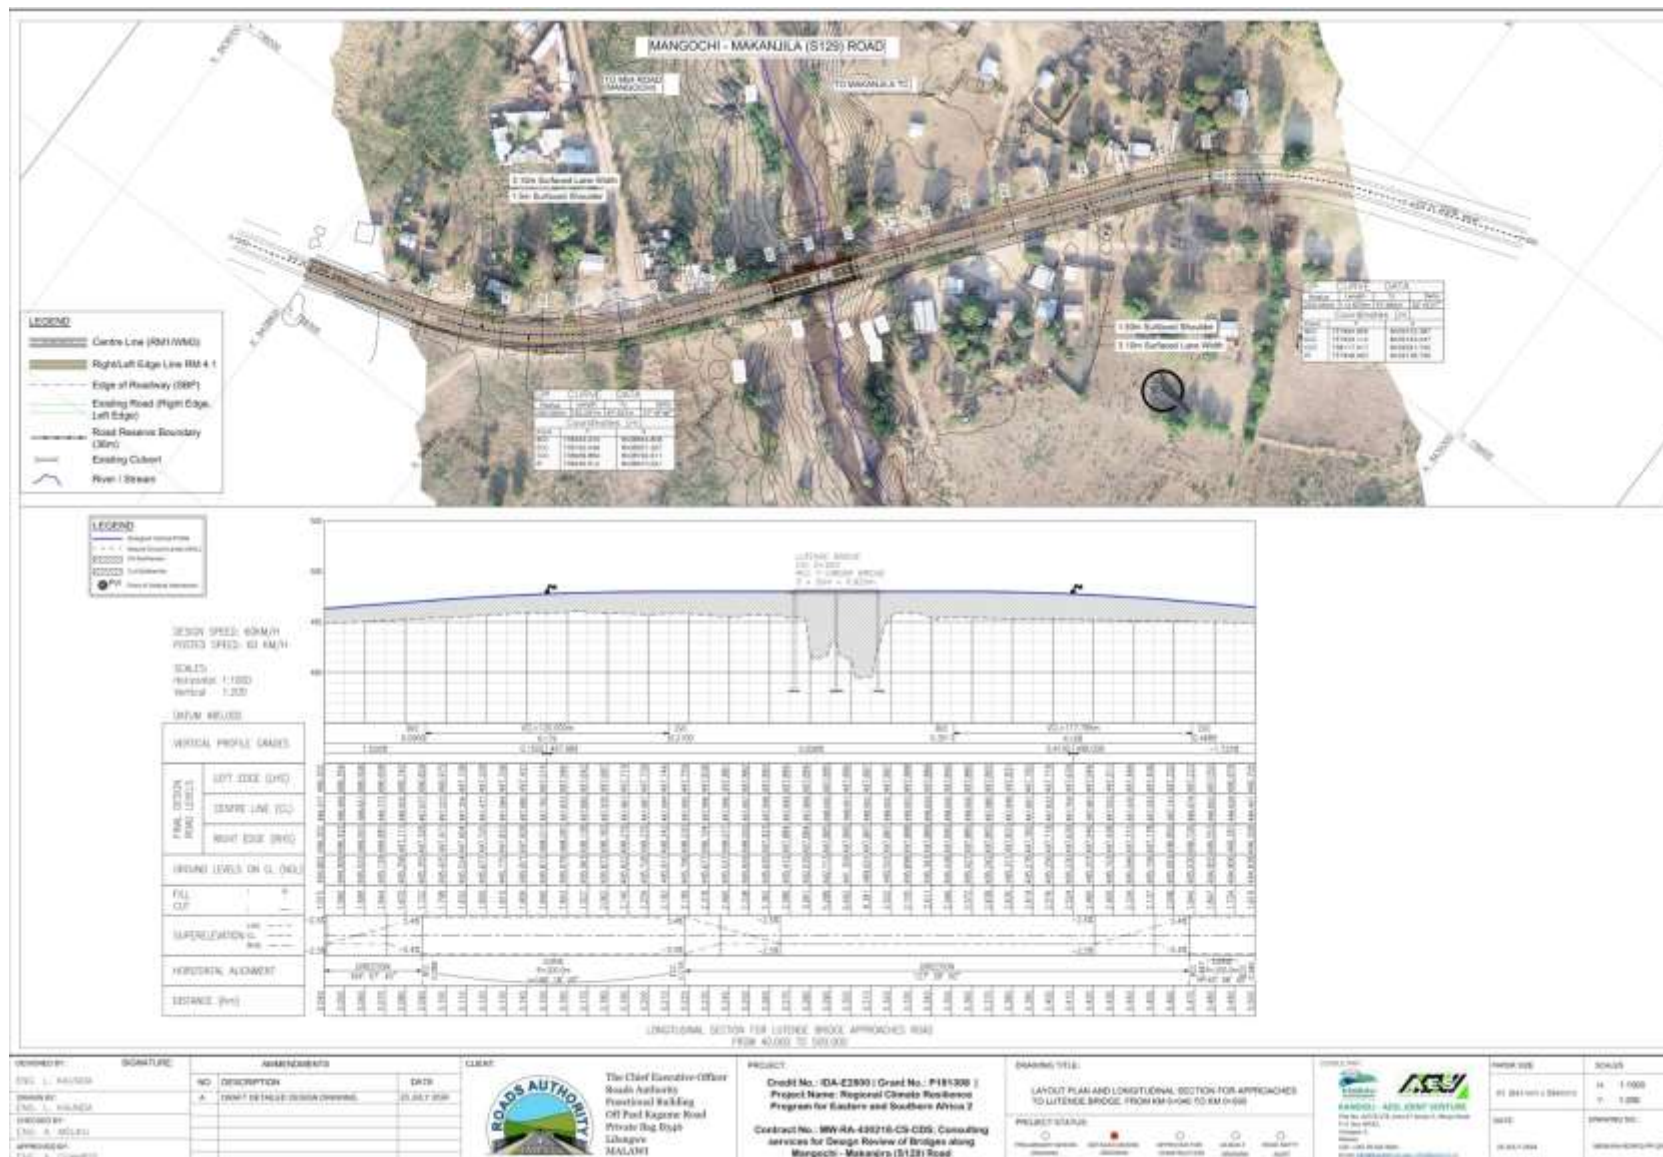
Lutende Bridge Layout Plan and Longitudinal Section for Road Approaches
